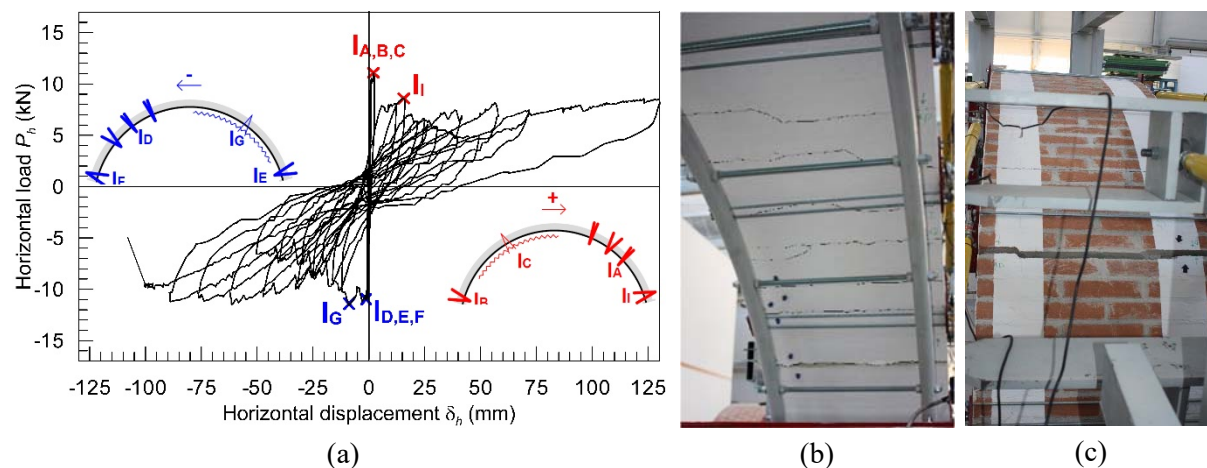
Sample V03-75-RI: (a) experimental P_h - δ_h curve, (b) bottom view of the mortar cracks of the right haunch, at collapse, and (c) detail of the sequential cracks formed in masonry, at left haunch
